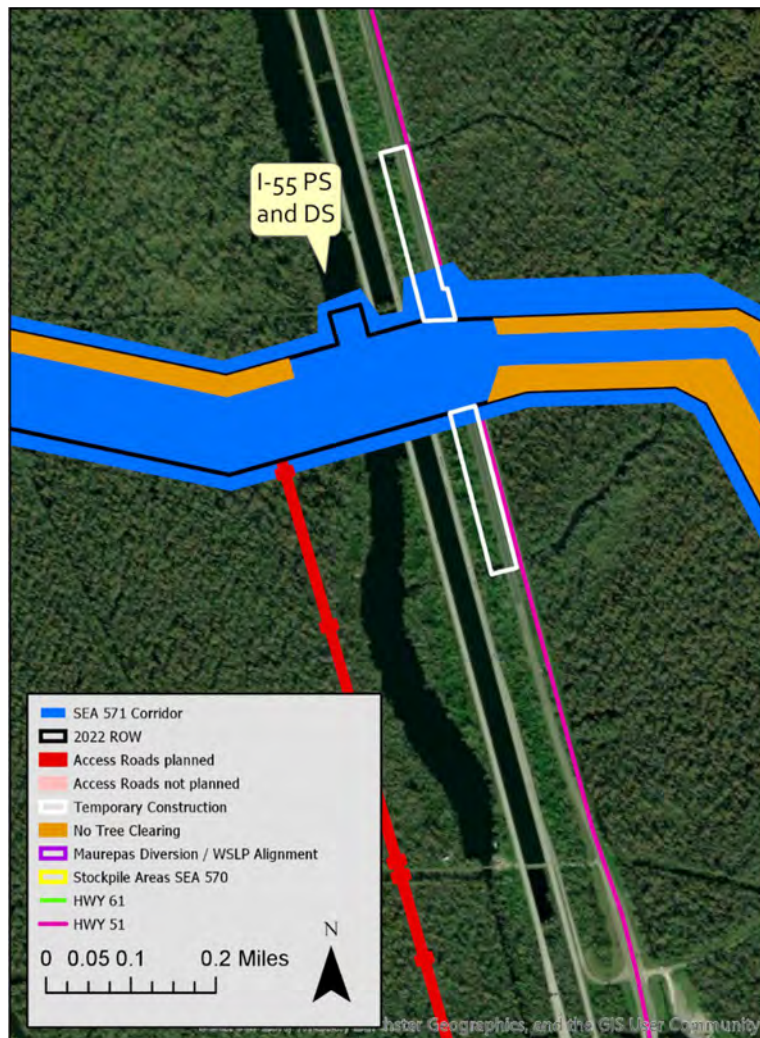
West Shore Lake Pontchartrain Project modifications showing temporary bypass roads (white outline) near the I-55 pump station and drainage structures.
